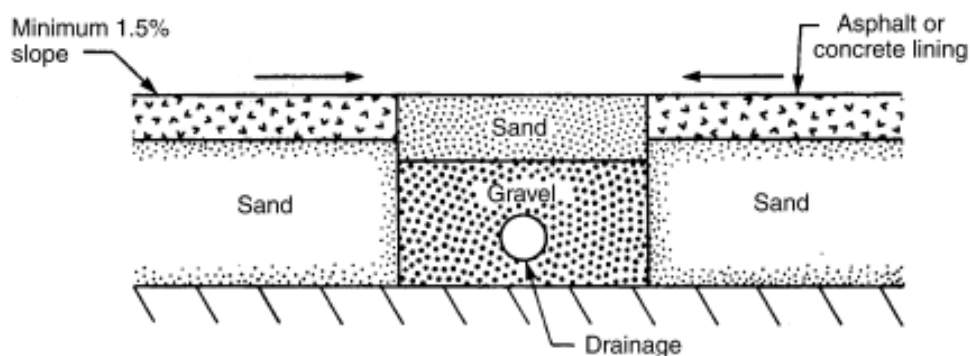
Typical paved drying bed construction (Nowak, 2007)
